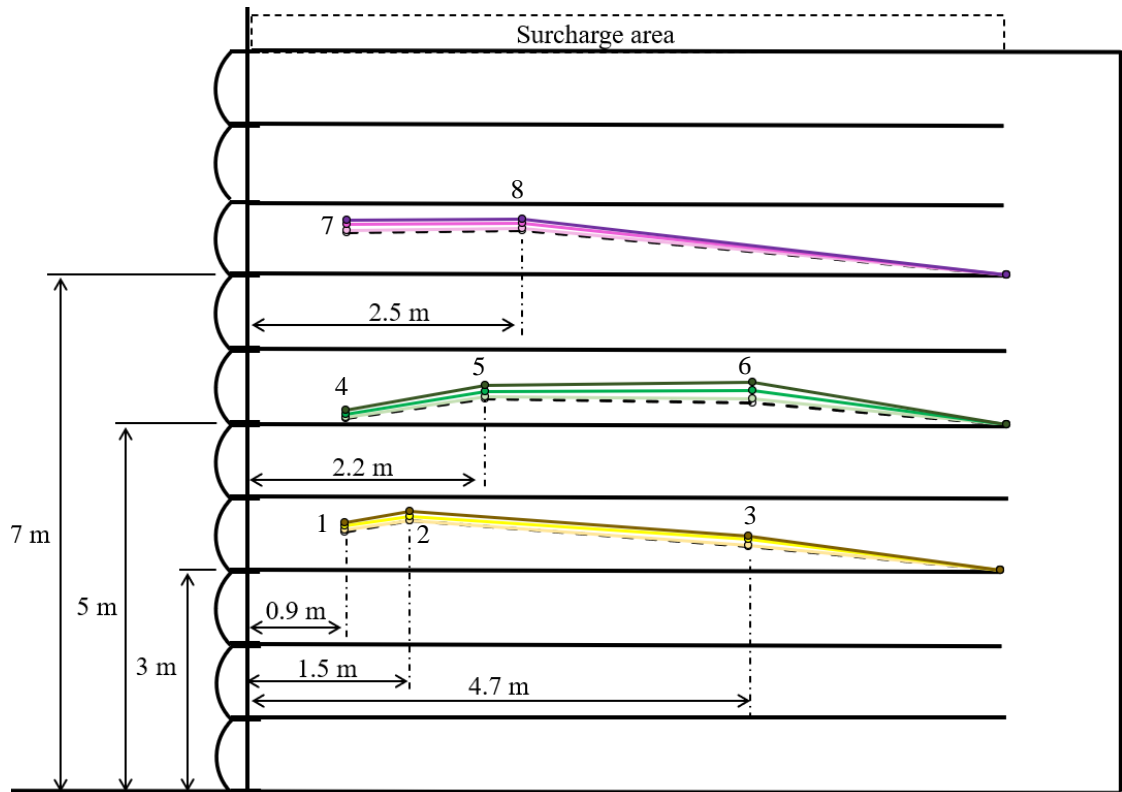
Representation of prototype soil wall cross-section with inextensible reinforcement tensile force development under applied surcharge load.
